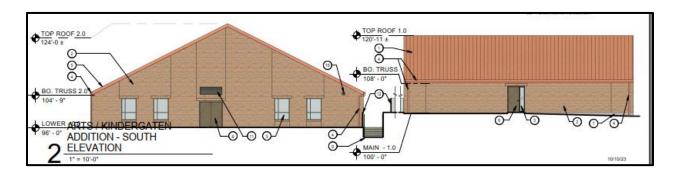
Fine Arts and Kindergarten Additions- South Elevations
